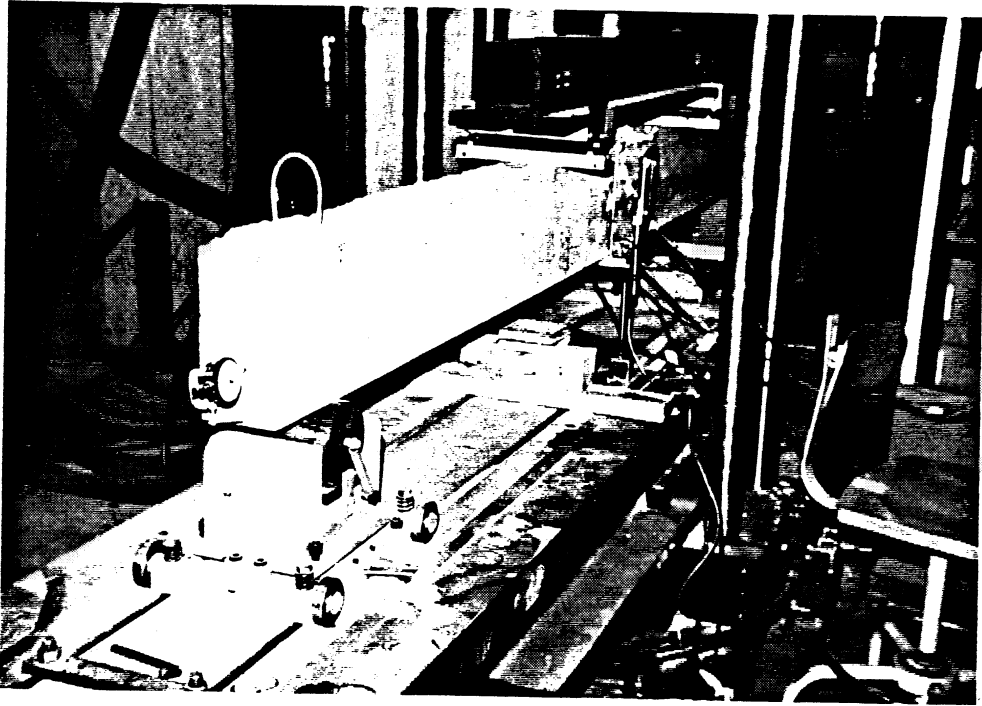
Dial Gage Mounting For Strand Slip Measurement
